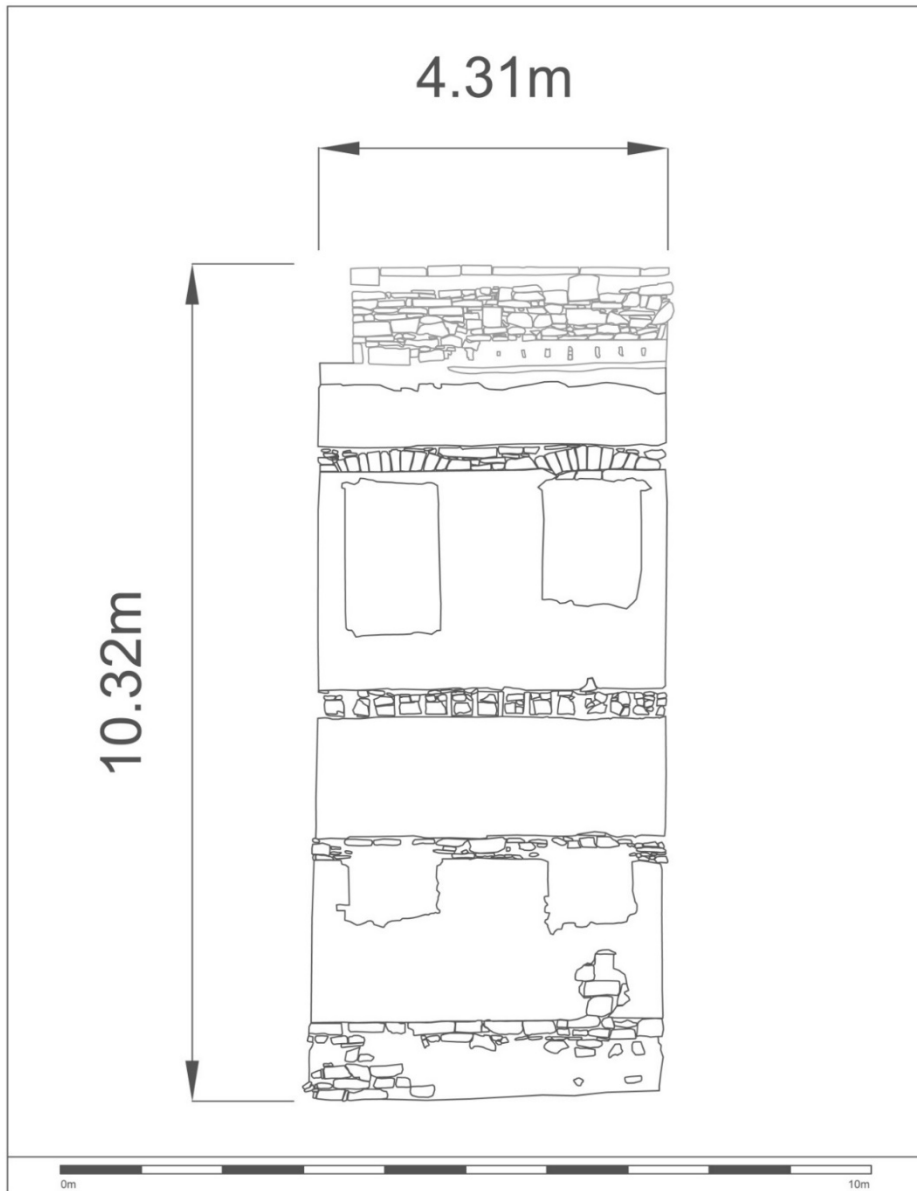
Internal elevation of the west wall of the signal tower at Carrowmably Signal Station.
